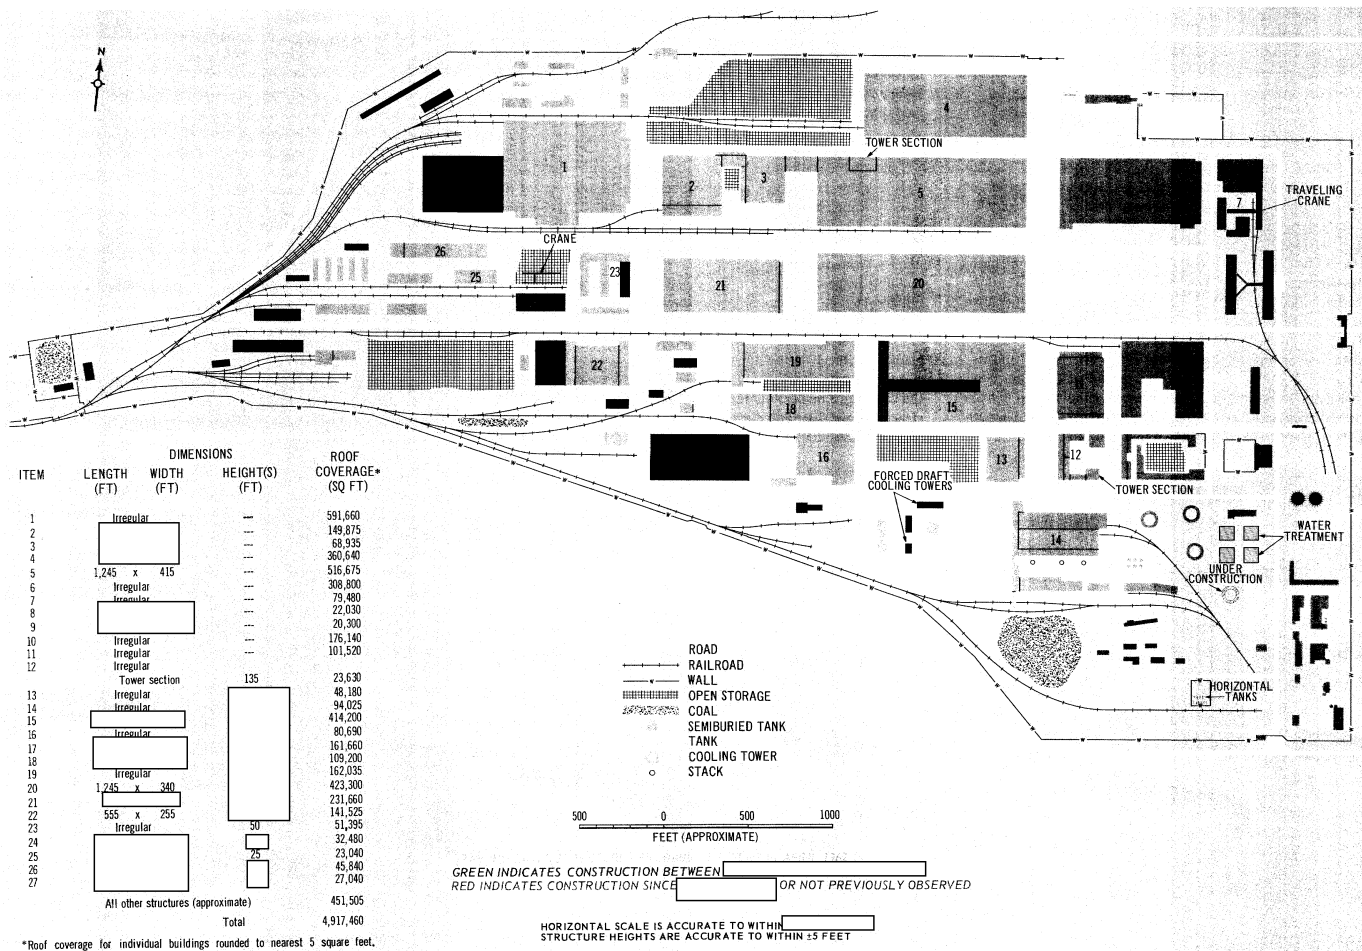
PLANT 186, LAYOUT AND ROOF COVERAGE.
